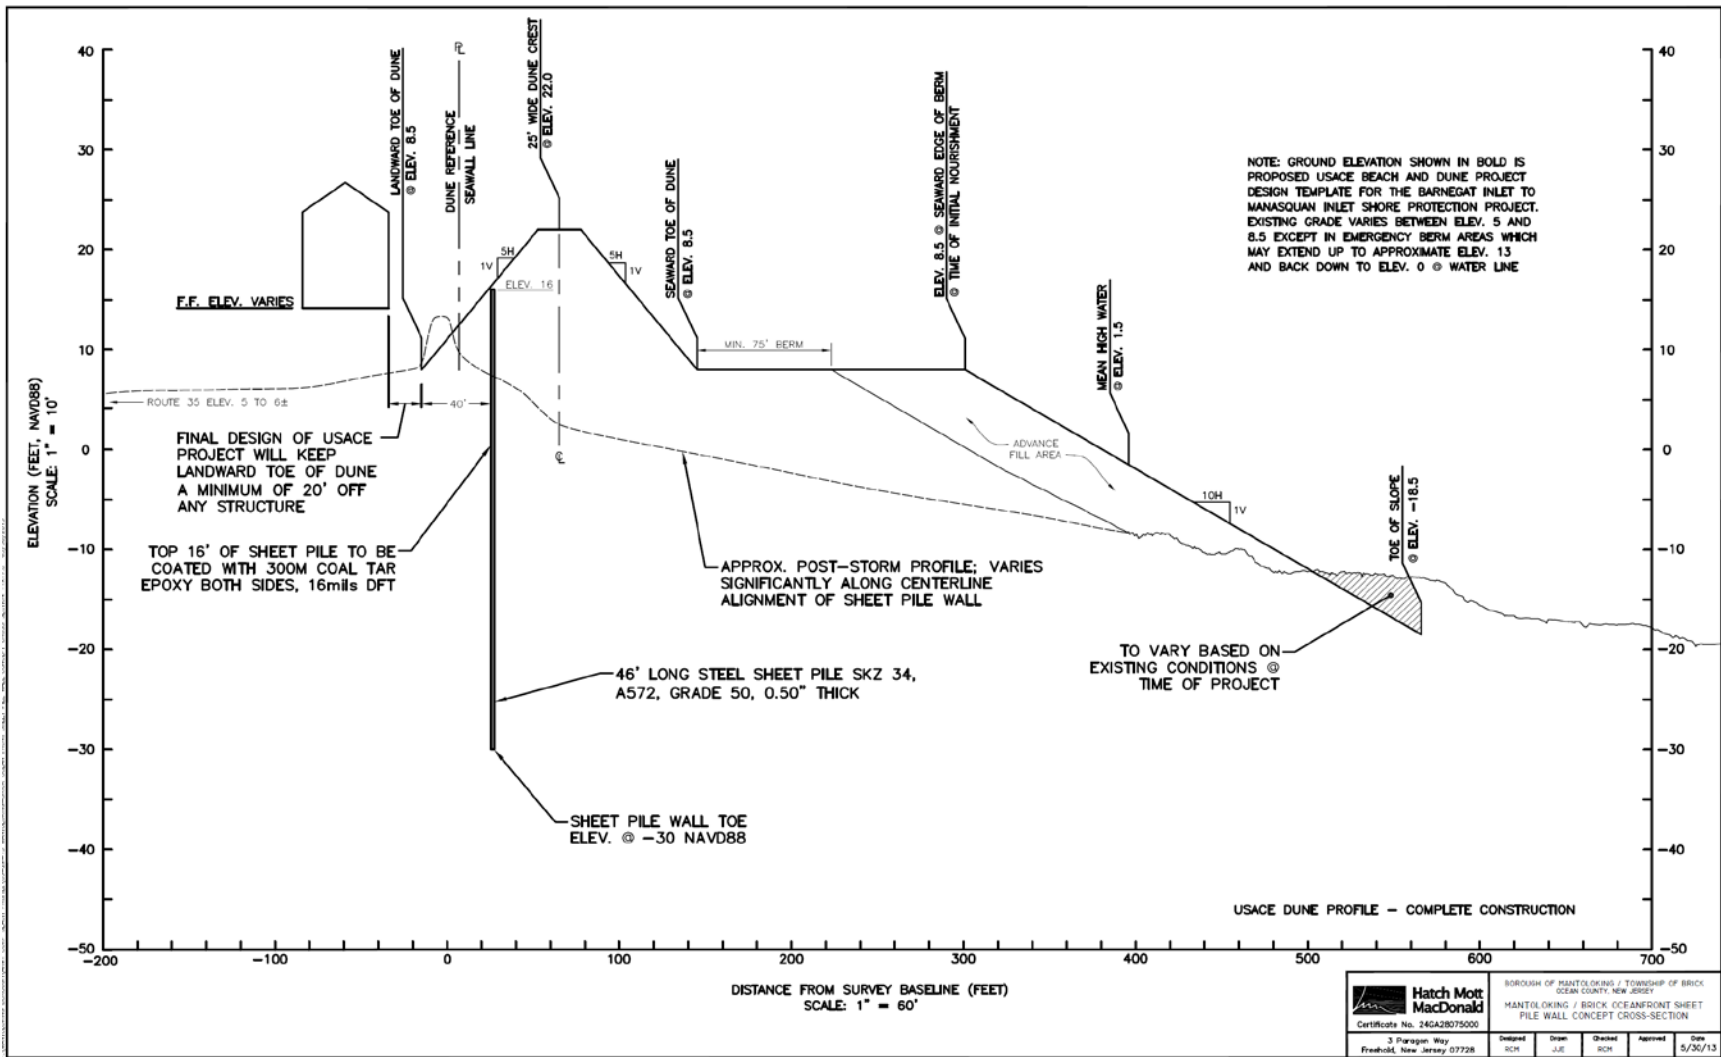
Concept Cross-Section for the Proposed Steel Sheet Pile Wall in Mantoloking and Brick Township
